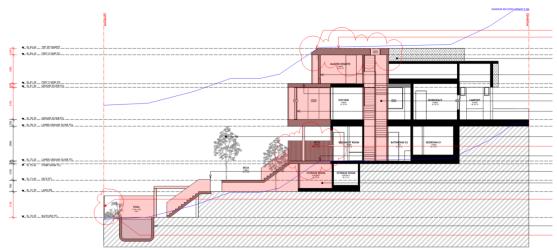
Section plan of dwelling at 13 Sully St (DA/271/2021) (Source: Design Tribe Projects)
